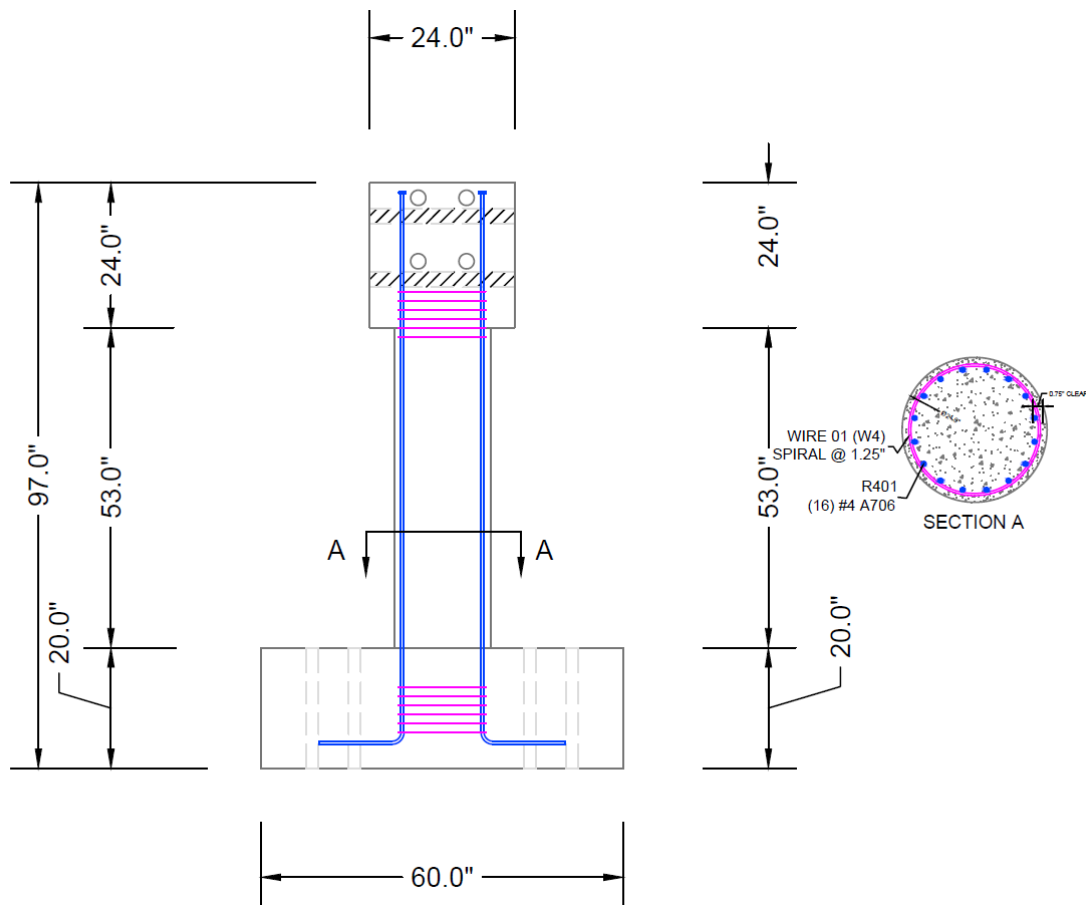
Specimen CIP-SF-REF-SHK elevation
